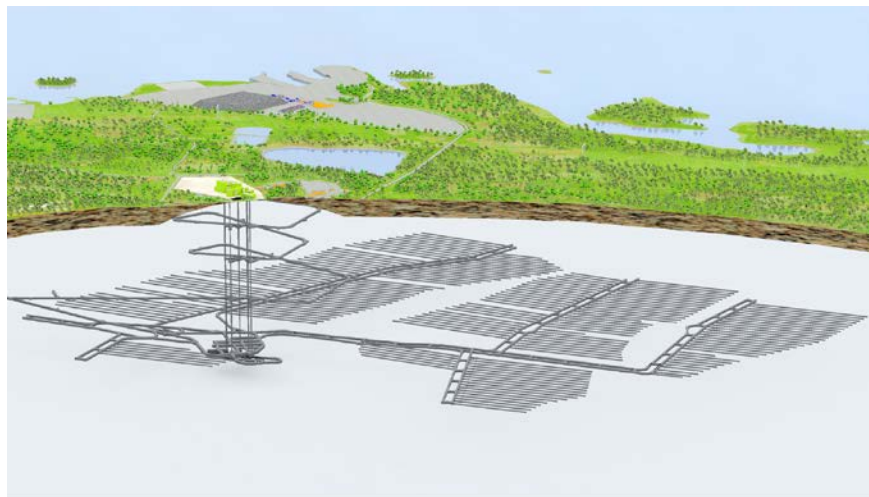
Repository lay out, access tunnel and shafts connected to above ground facilities.
